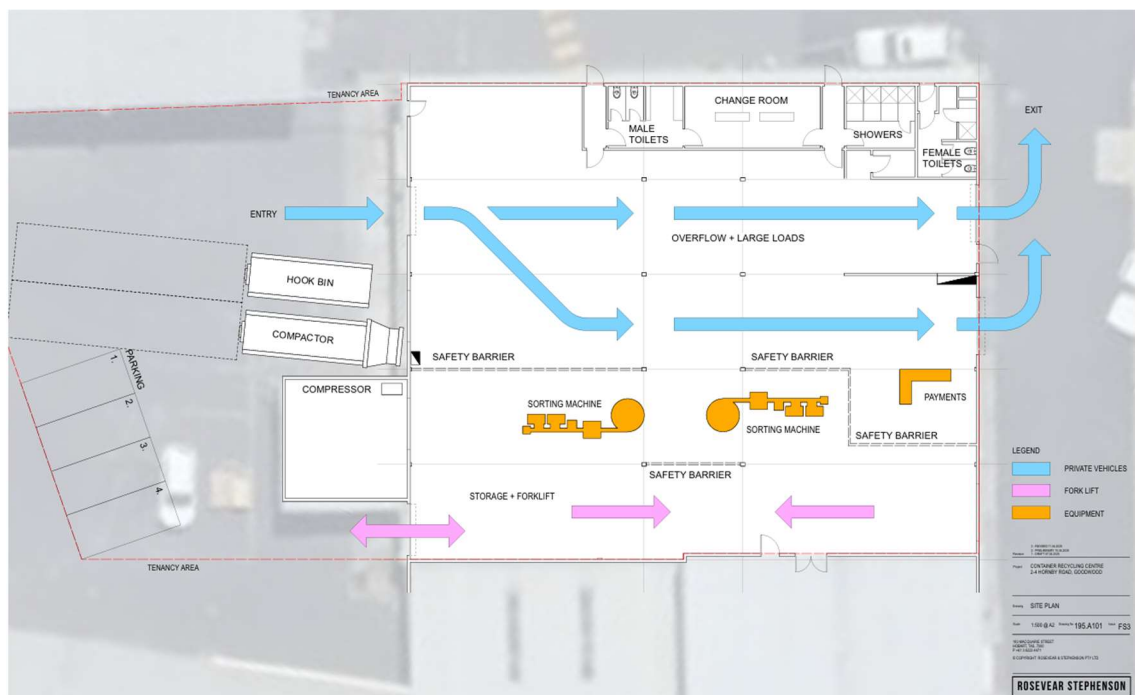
Proposed internal layout of Container Refund Facility. (Source: Rosevear Stephenson)
